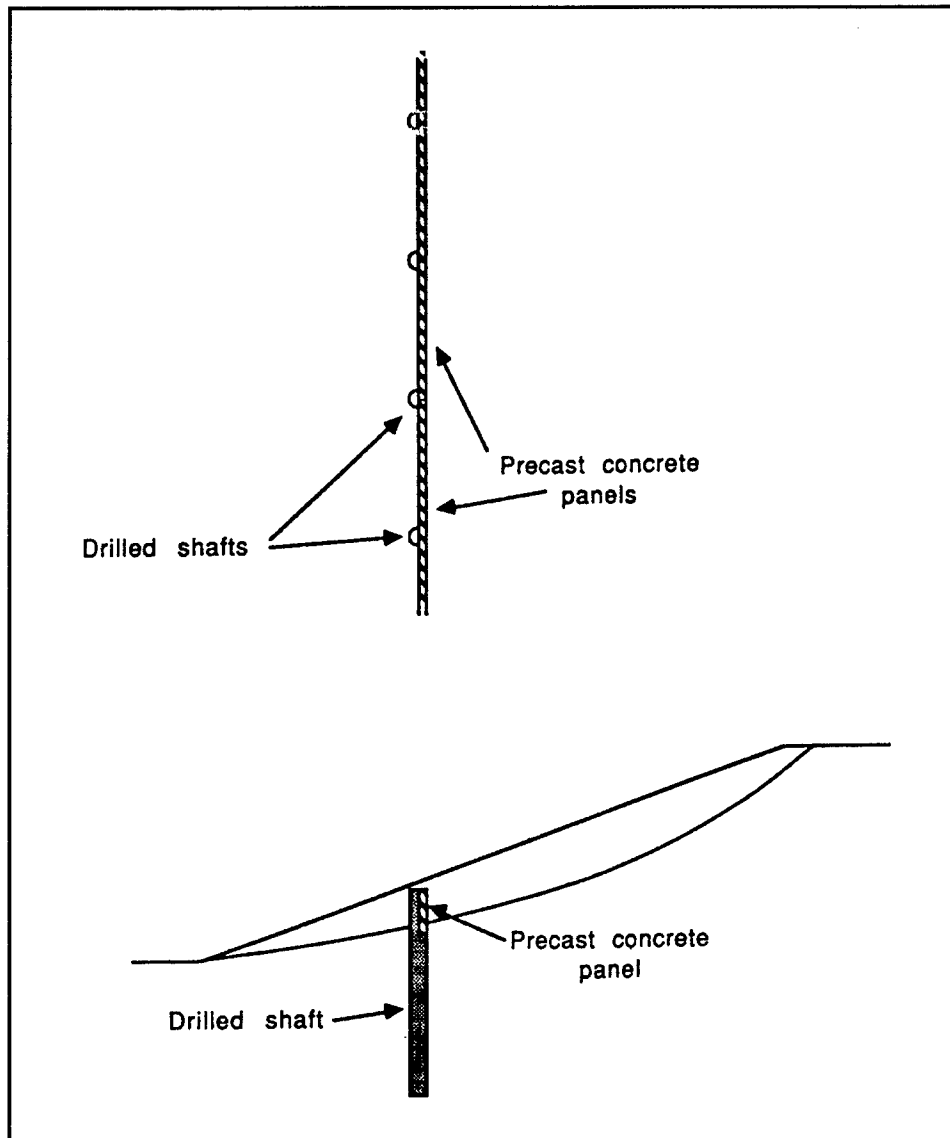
Slide suppressor wall with precast concrete wall panels to retain the soil (courtesy of Transportation Research Board, Isenhowe, Wright, and Kayyal 1989)
